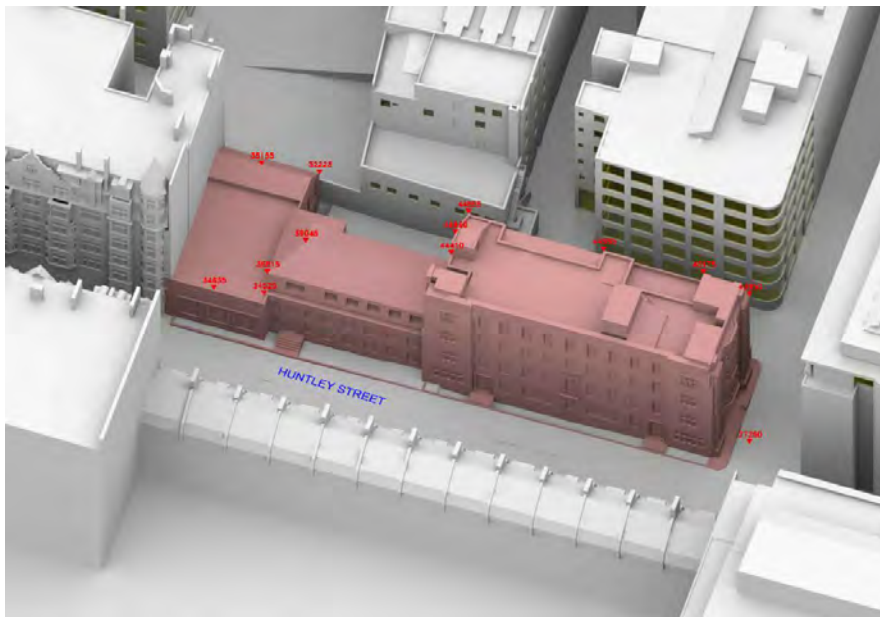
UCLH Site Buildings (in pink) and the surrounding context
